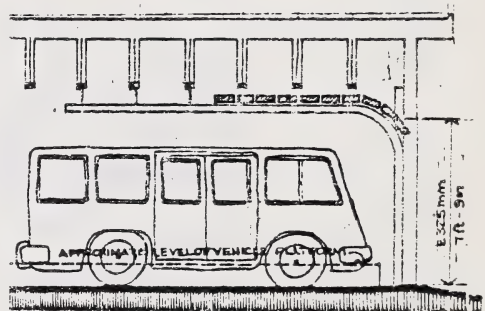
A: SECTION THROUGH GARAGE SHOWING LINE OF ARRIVAL PLATFORM
